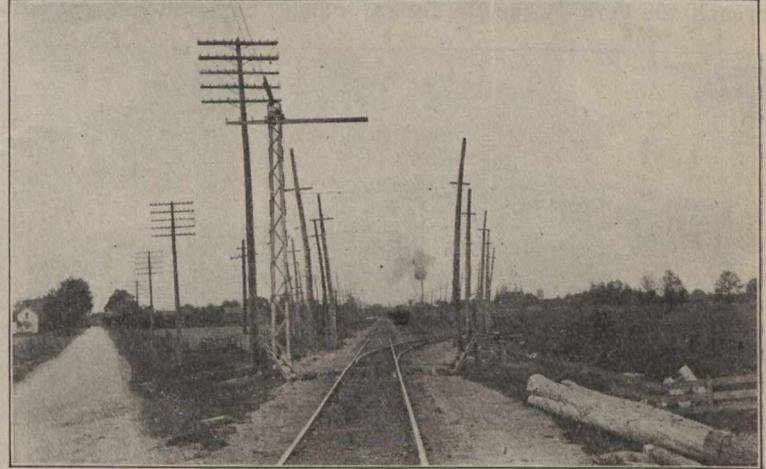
St. Thomas Yard, Looking North from Southerly Approach.
